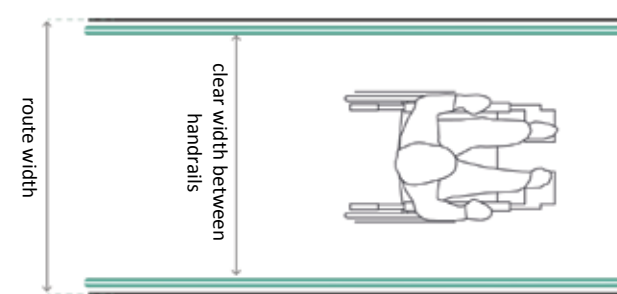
the minimum clear width of ramp, stair or corridor should be considered the in-between distance of handrails on both sides.
